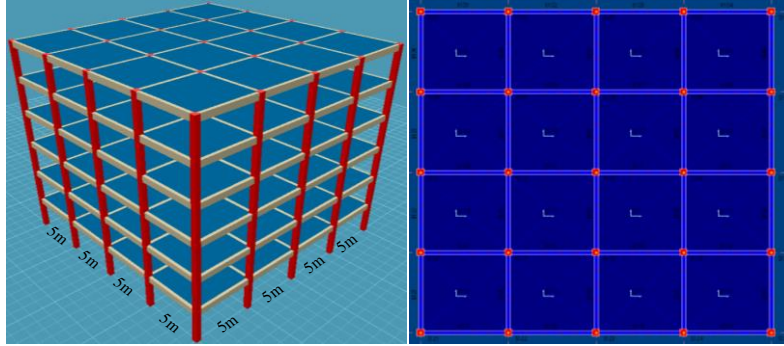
Views of six-story (ground floor +5 typical floor) of the model considered in this study
